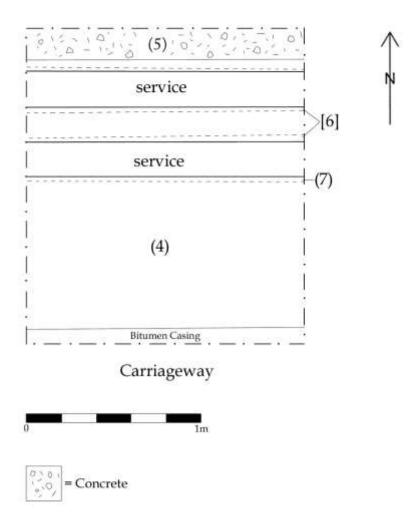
Plan drawing of the trench. Original drawn at 1:20.
